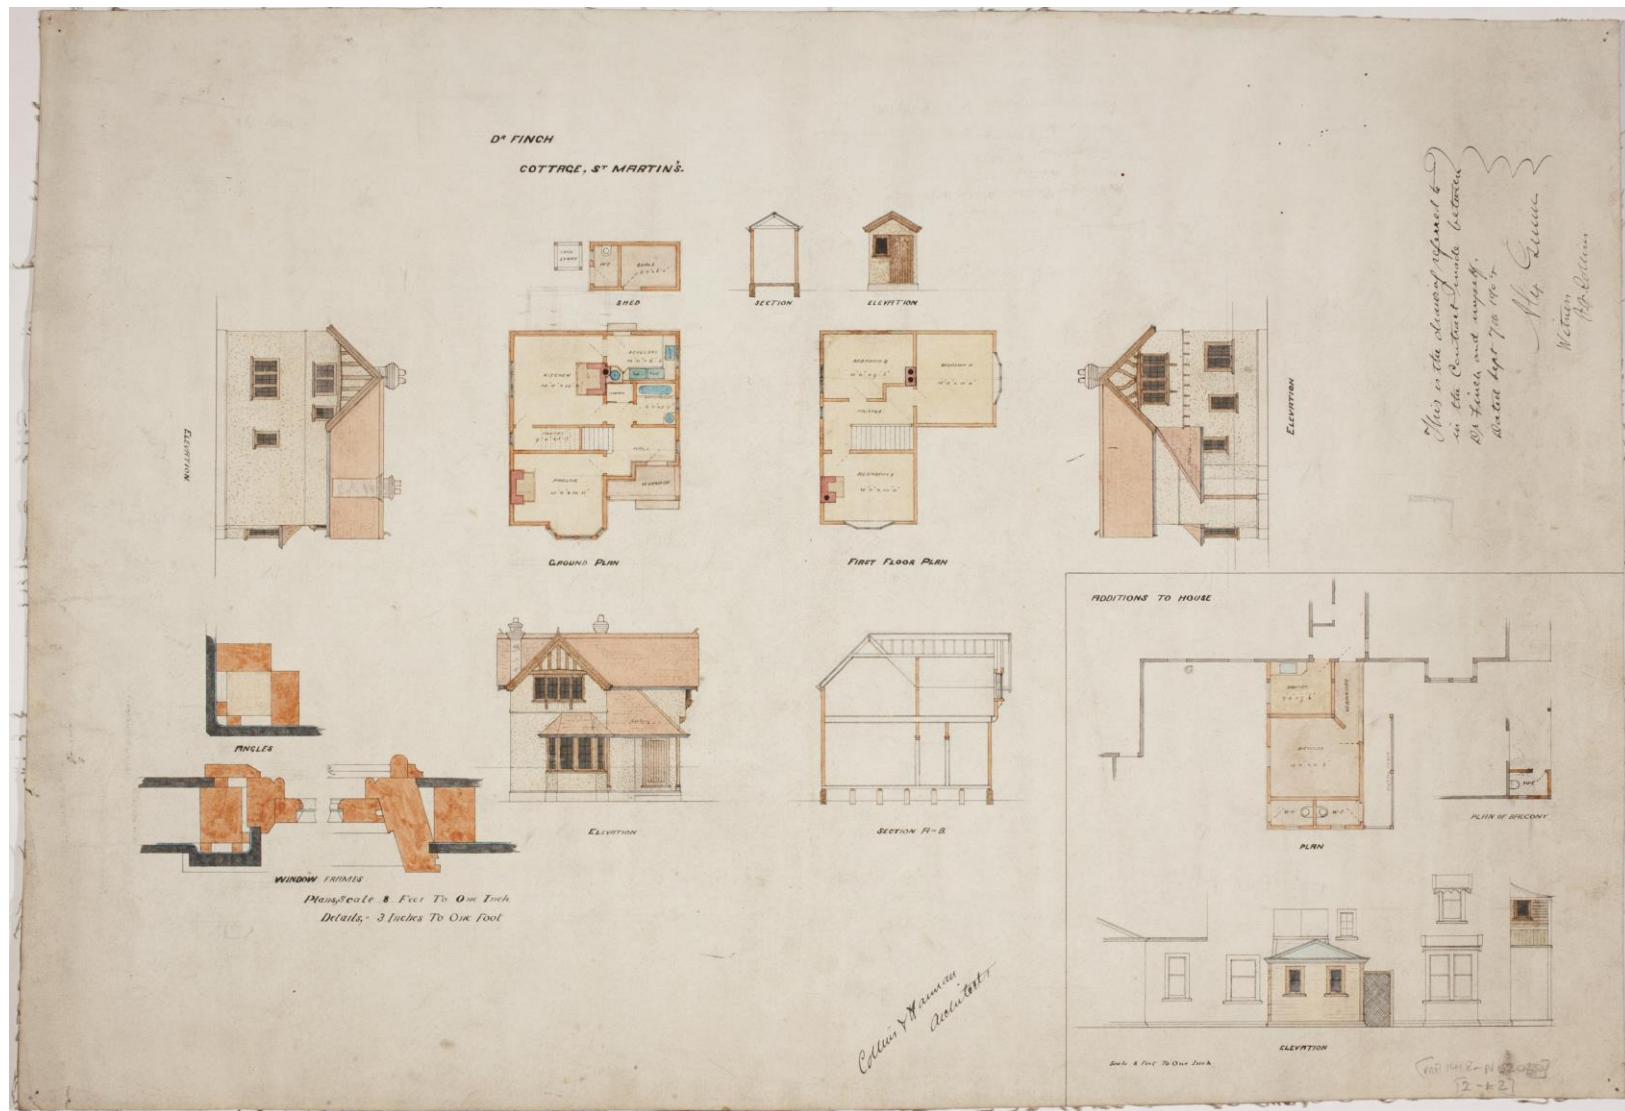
Collins and Harman, Dr Finch, Cottage at St. Martin's and additions to house, plans, elevations, sections and details (1905).
